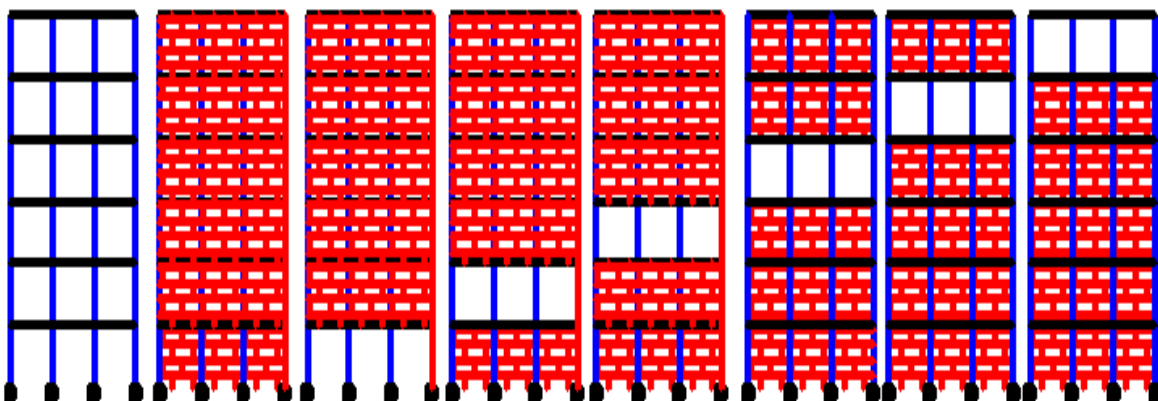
Elevation detail of six-story RC bare, regular and infill frames
